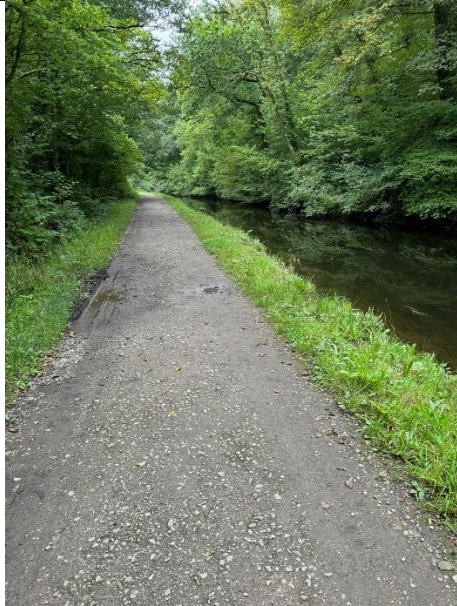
Canal section near Ynysnedd Bridge with slight flooding on footpath
